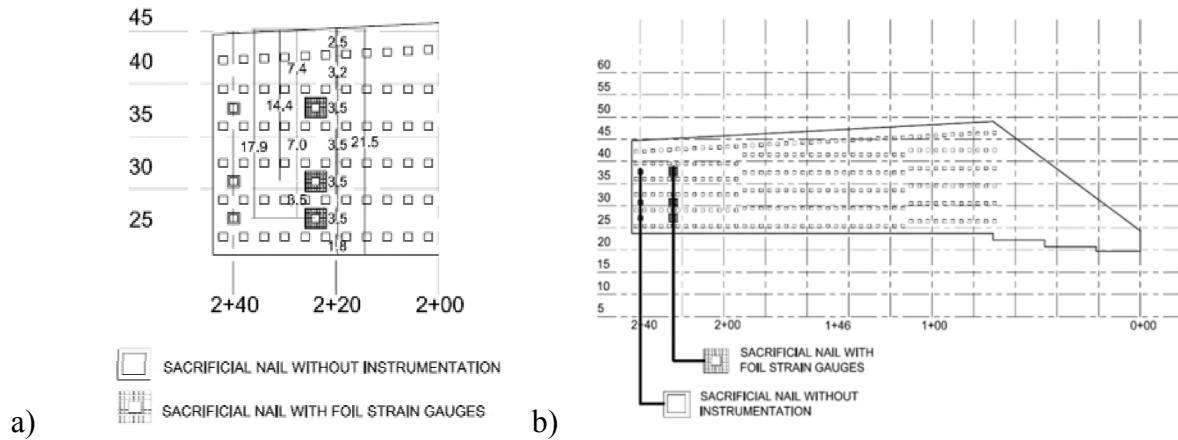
Positions of the Sacrificial Nails at the Soil Nail Wall Profile at a) Section 2+20, and b) Front View of the Embankment.
